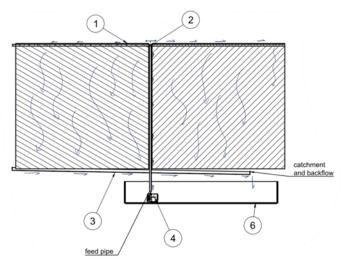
Wet wall with Netting (1), galvanised 1/2 inch pipe for structural support (2), gutter pipe (3), Pump with delivery pipe (4) water tank (6)
